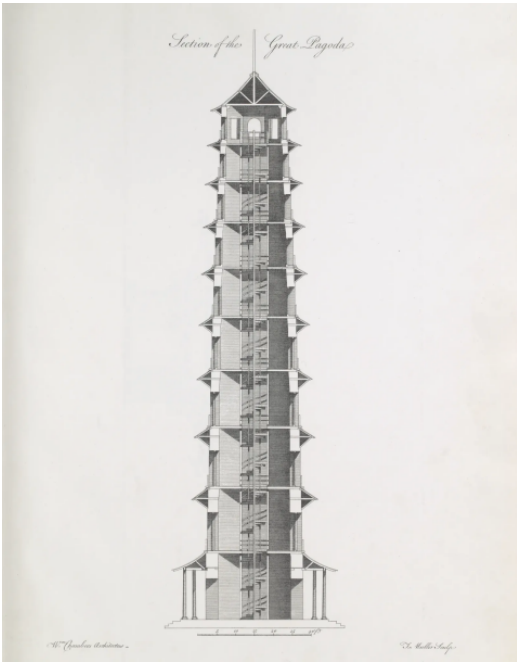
The Great Pagoda, from plans, elevations, sections and prospective views of the Garden Buildings at Kew, William Chambers (1763)
